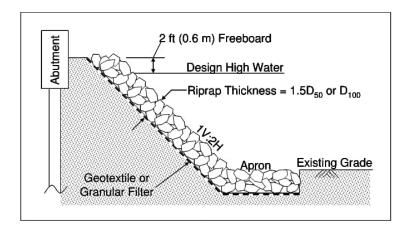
Riprap Revetment Details (DG-14 HEC-23)
